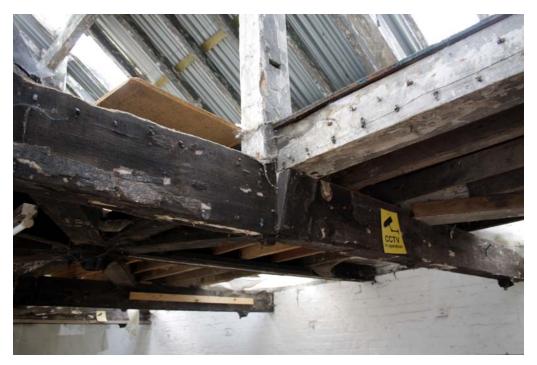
Detail of connection of queen post to the tie beam and cart wheel roof structure
